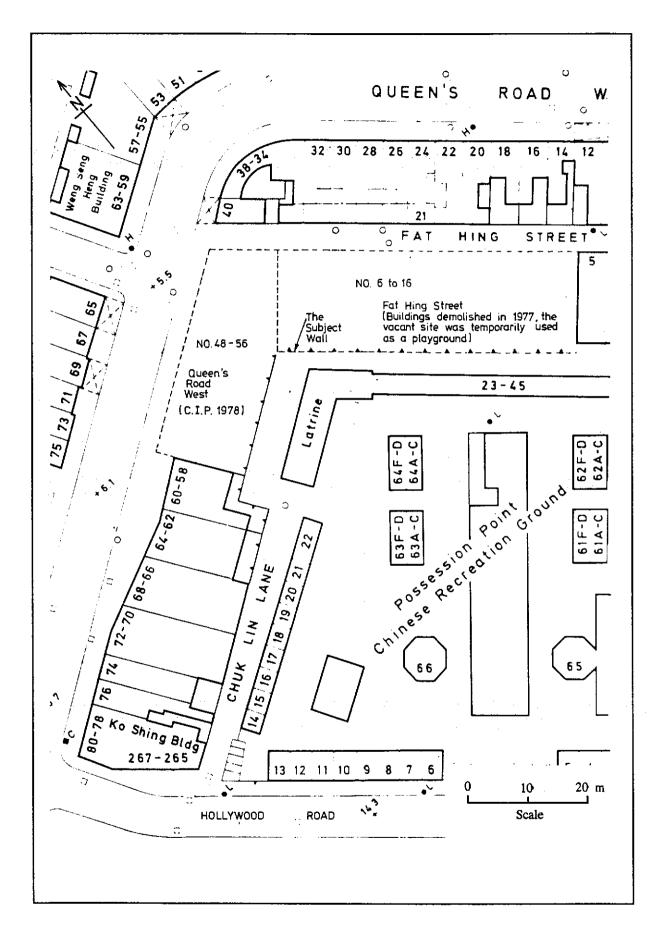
Retaining Wall at Fat Hing Street - Site Plan
